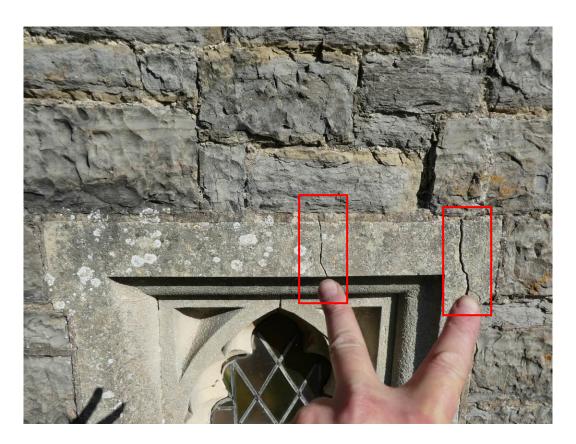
P1000364 Masonry Fractures in 3rd Stage Window Header South Elevation
